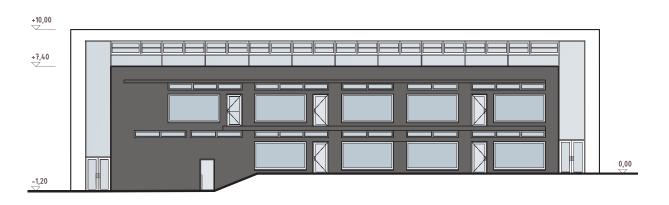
FACADE TOWARDS WEST, SCALE 1:250.
